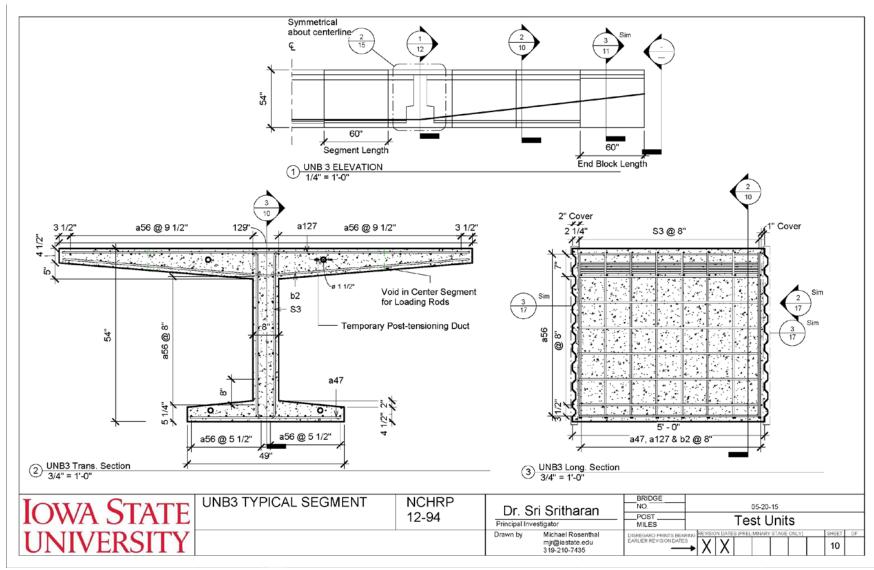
UNB3 Typical Longitudinal and Transverse Section
